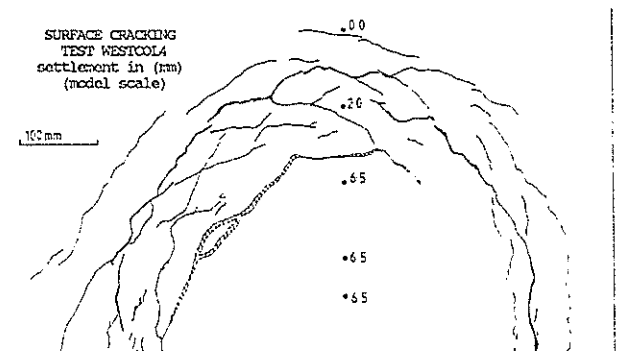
Trace of ground surface crack pattern after test Westcol4.
